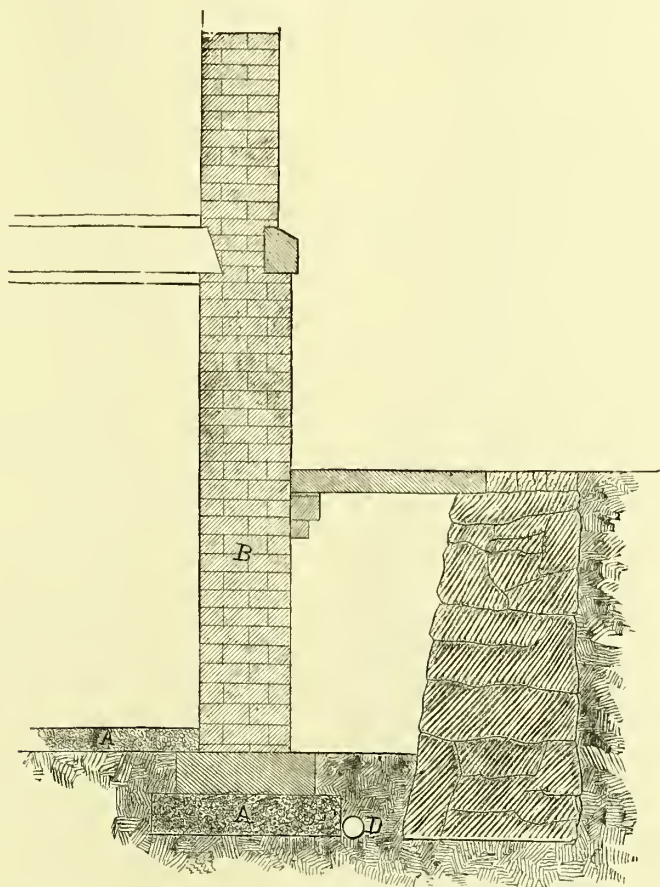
The letter A indicates concrete; B, the wall of the building; C, the independent wall, and D, the drain-pipe at the bottom of the foundation.
